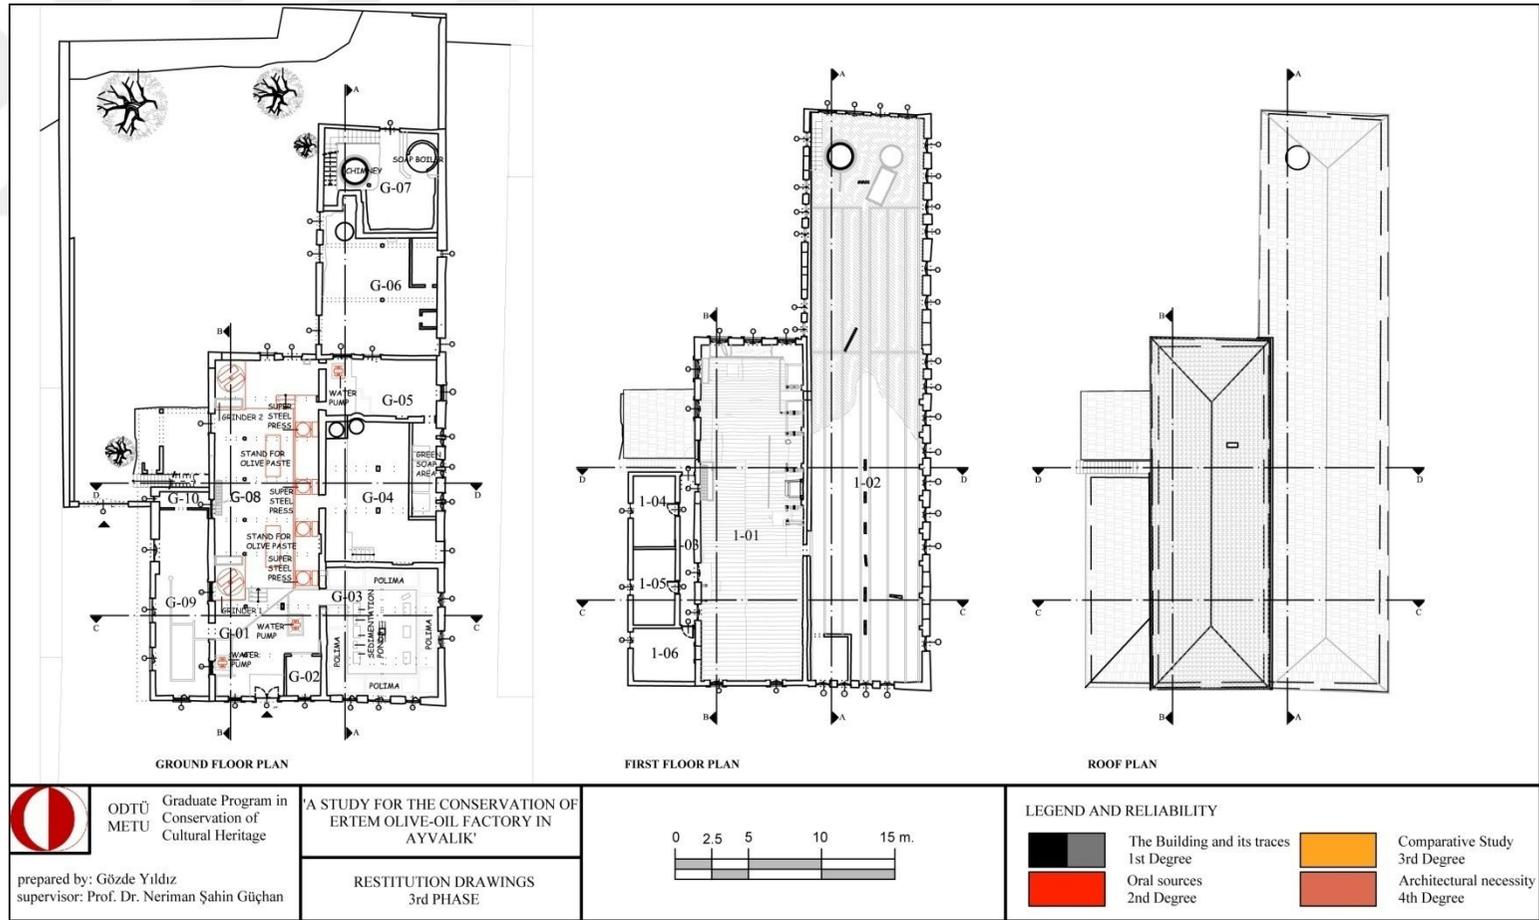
3rd Phase of the Factory, floor plans and roof plan
